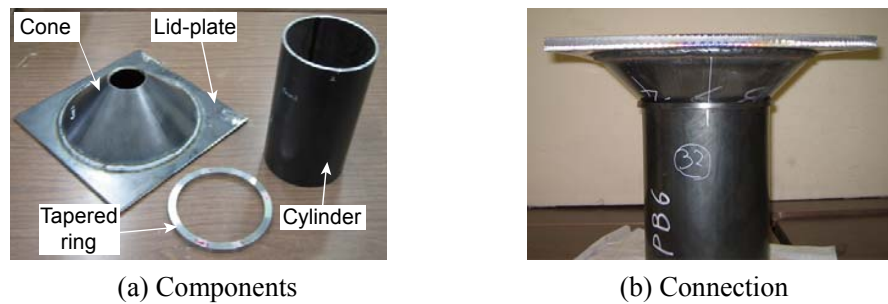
Components of steel cone-to-cylinder socket connections
